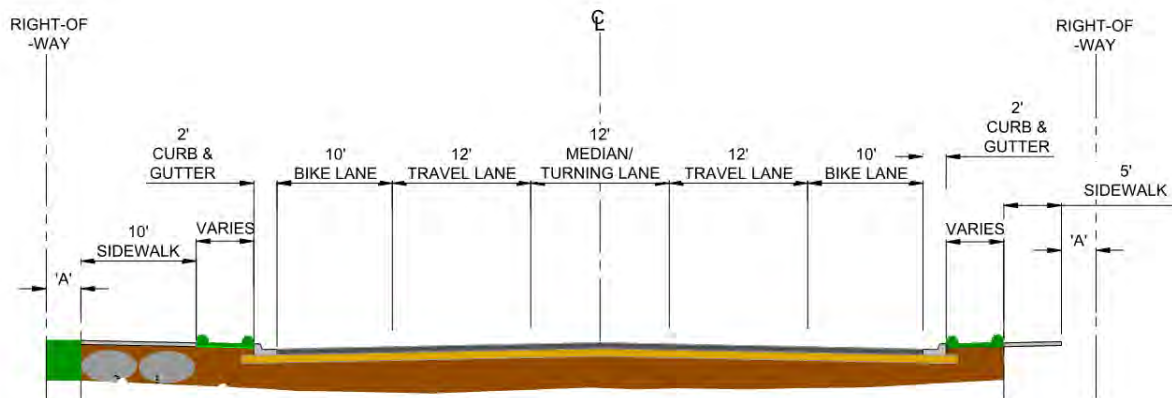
Proposed roadway section for Converse Avenue (facing north).
